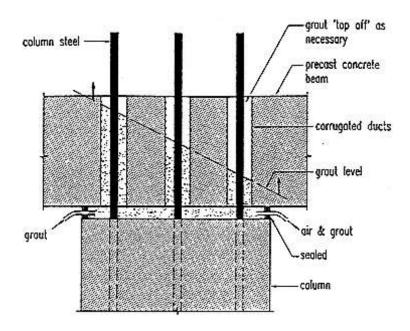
Grouting of Bedding Layer and Ducts [2.20]
